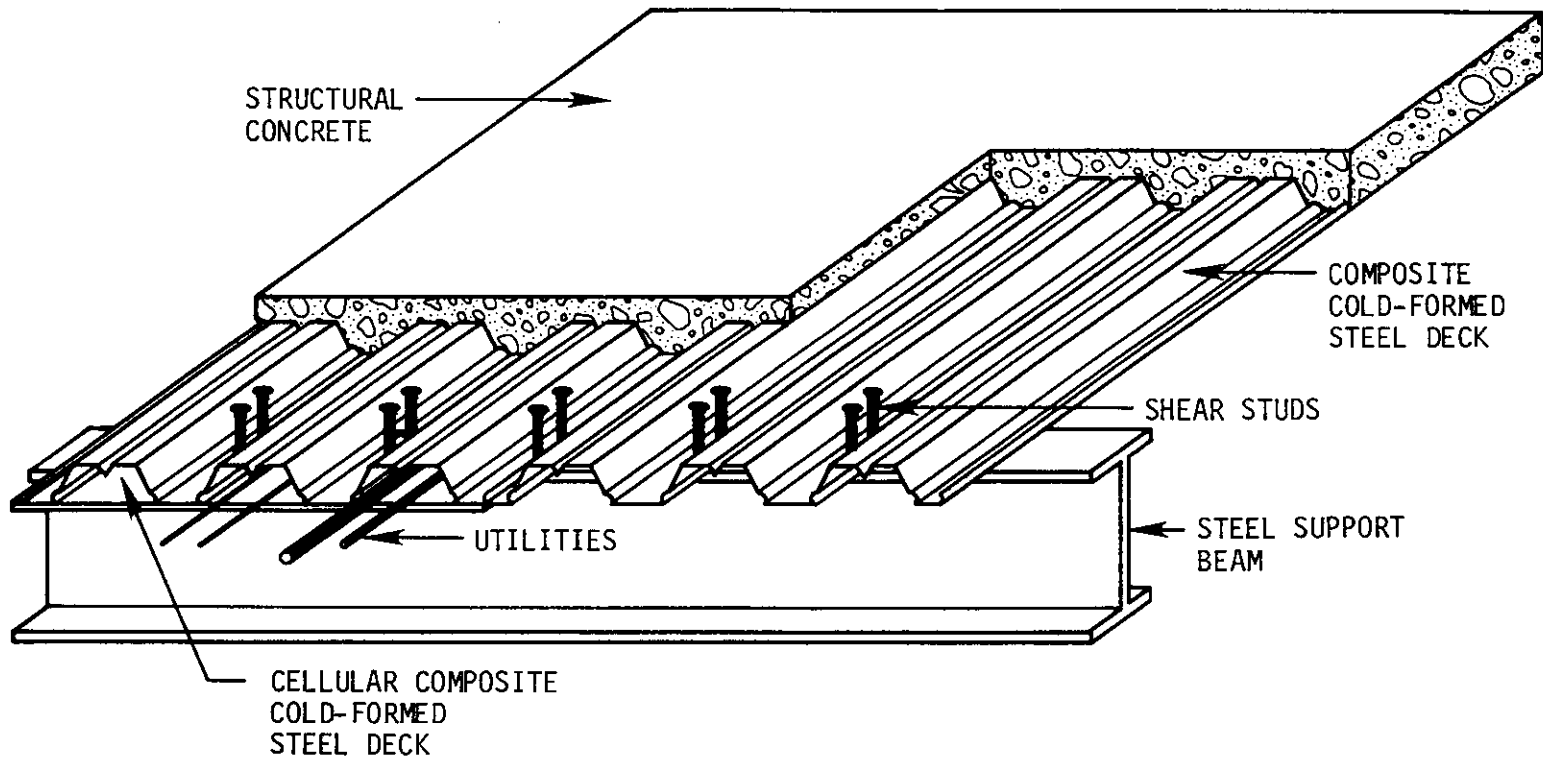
Typical construction utilizing cold-formed steel decking with composite support beams.
